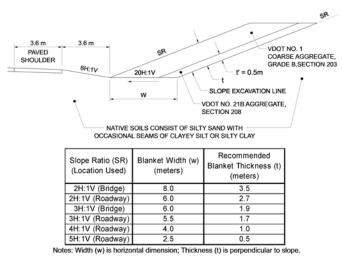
Original Schematic Design Cross-section of the Cut Slope (after HDR Engineering, Inc., 1999)
